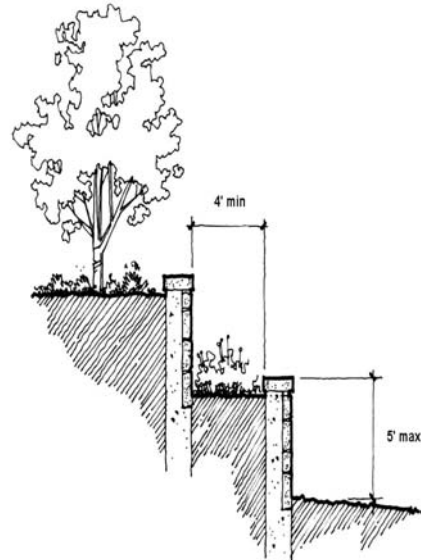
The width of the terrace between any two 5-foot retaining walls shall be a minimum of 4 feet with a maximum slope of 3:1.
